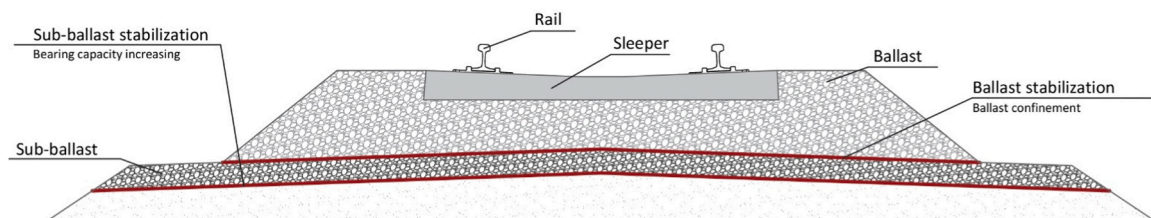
Installation of horizontal reinforcement in a ballasted rail track.
